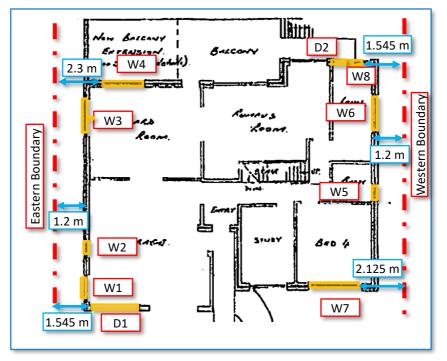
Ground floor plan showing unprotected openings and distance to eastern and western boundary
